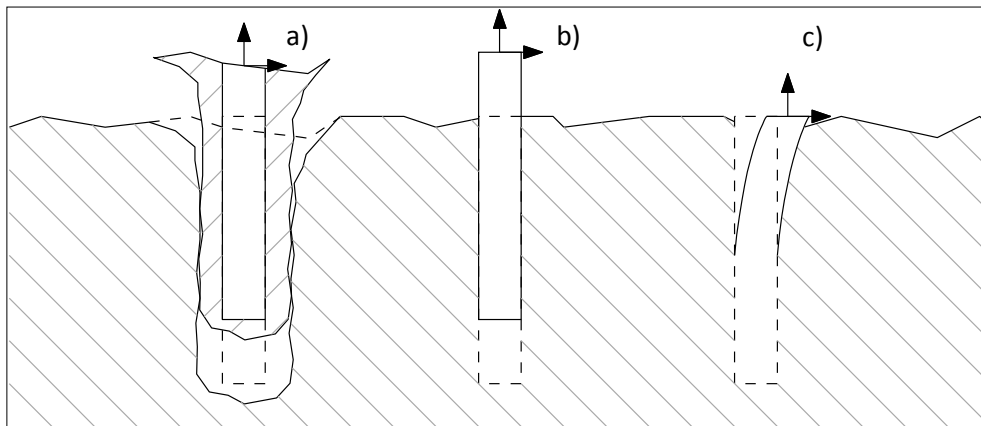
Typical failure modes of offshore piles installed in rock reproduced from [99]: Uplift failure of (a) pile and rock mass and (b) grout-to-rock bond and (c) lateral bending failure of rock and pile
